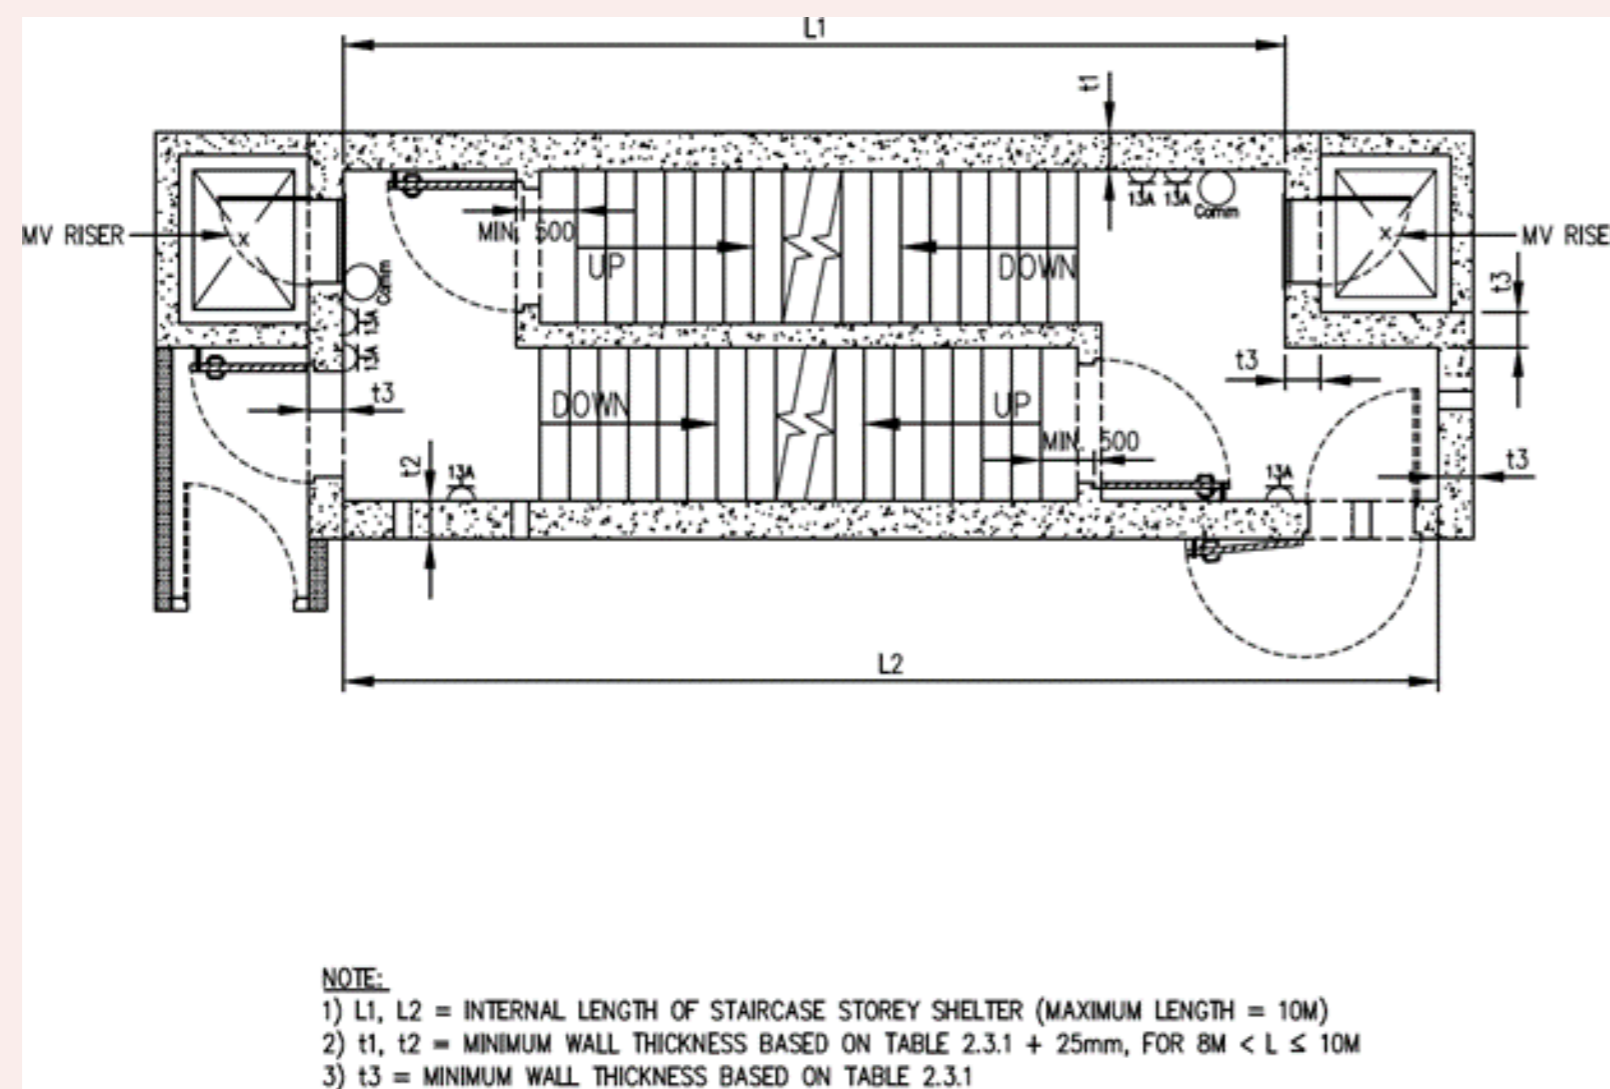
(b): TYPICAL LAYOUT OF S/C SS
